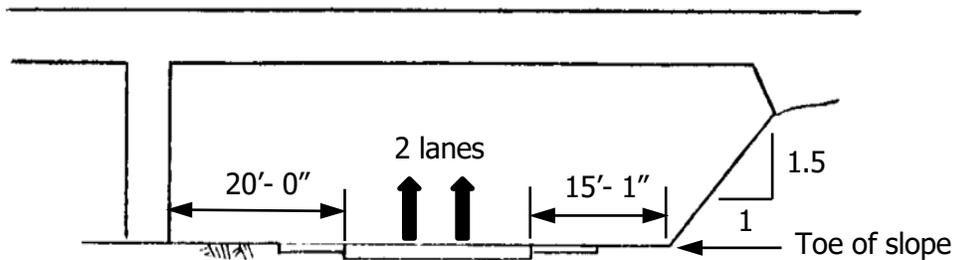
Bridge elevation view of horizontal clearances for a 2-lane highway with 1-way traffic below the bridge.
